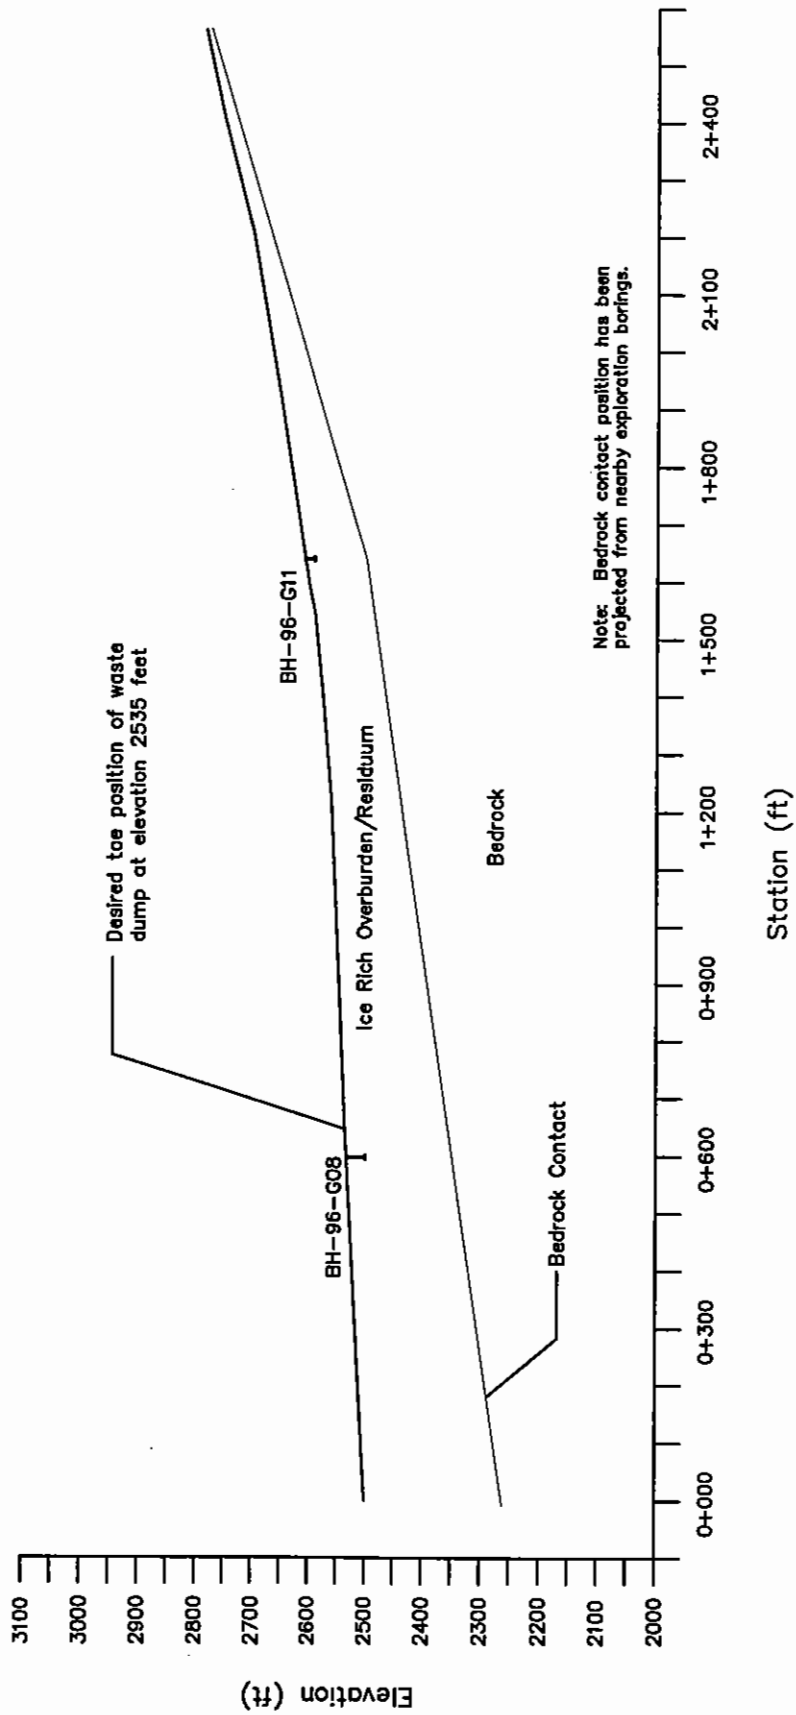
CROSS SECTION OF PROPOSED SOUTH WASTE DUMP AREA
